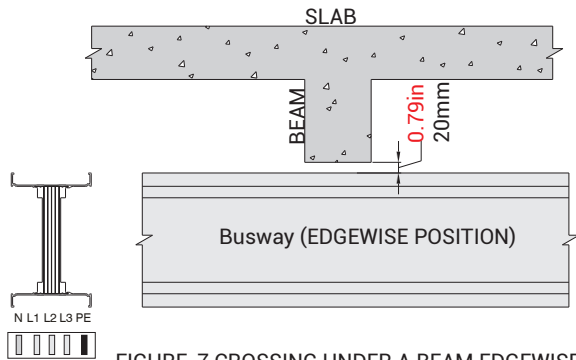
CROSSING UNDER A BEAM EDGEWISE POSITION
